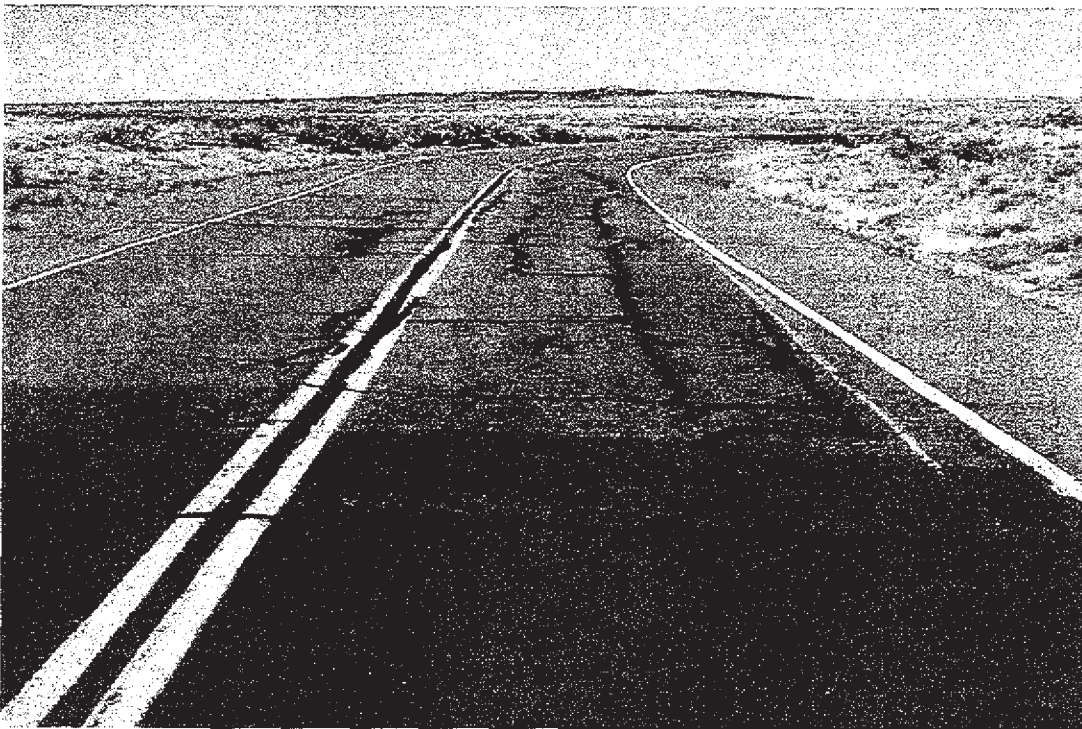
MP 0.02 - Pavement Change, Typical Pavement Section
